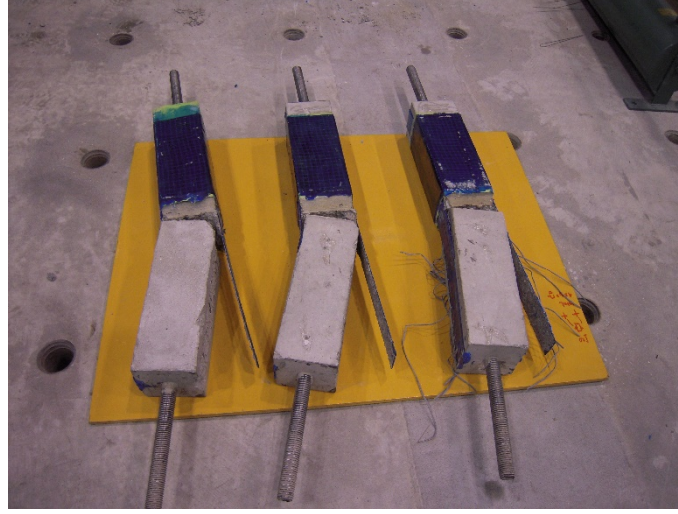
Typical failure model of bonding test (Epoxy 2 layers).
